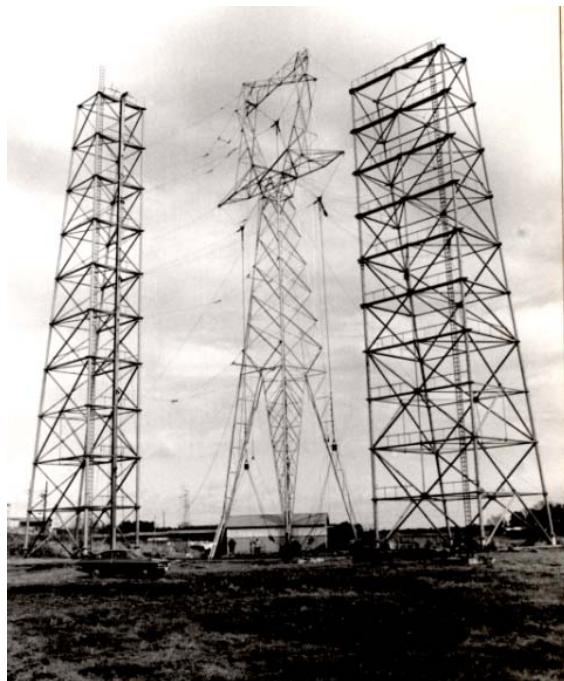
, Full-scale Tower Test (Courtesy of BPA)
